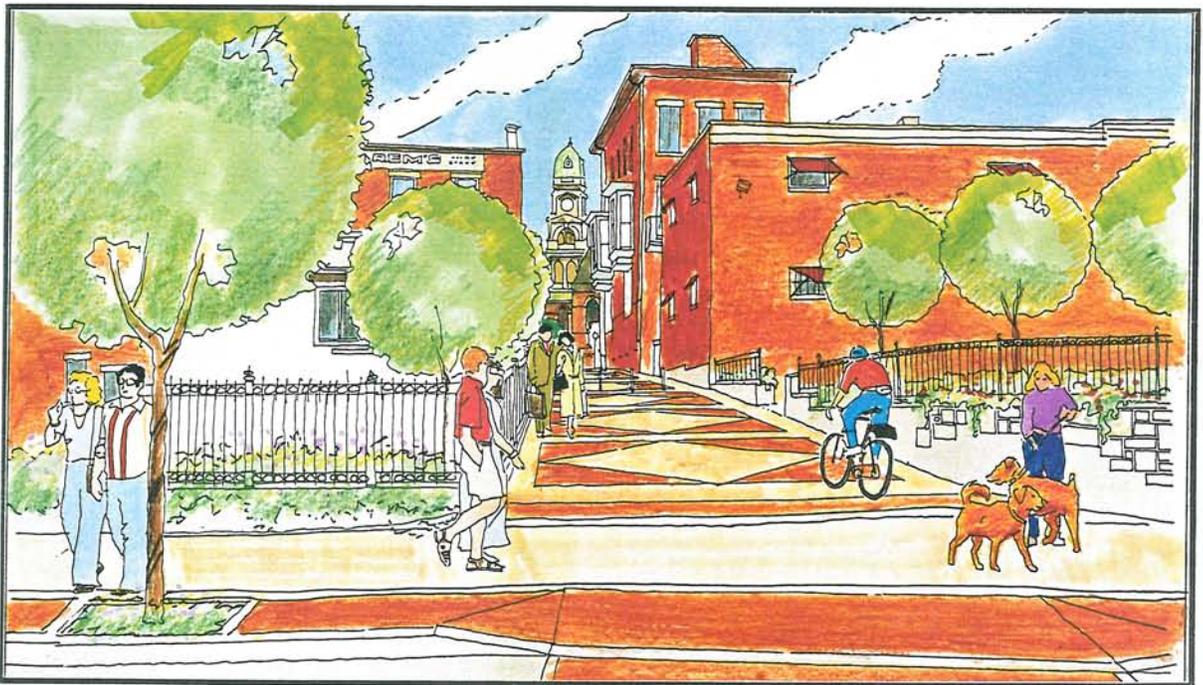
Plan at Parsons Street - Proposed Improvements
